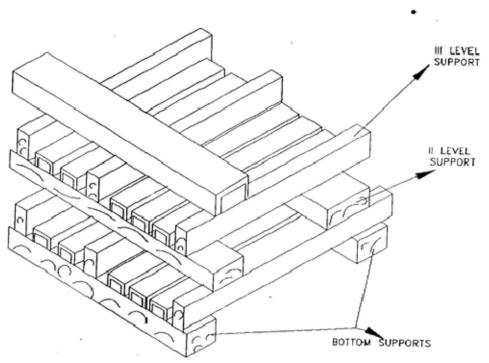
STRUCTURAL STEEL STACKING ARRANGEMENT
